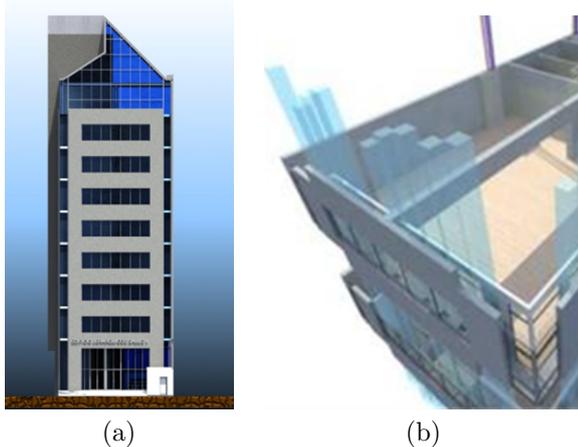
a) Scheme of the building with double facade. b) View in section and perspective of the double facade.
